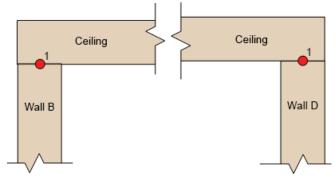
Ceiling—wall joint temperature measurement locations (second floor).
